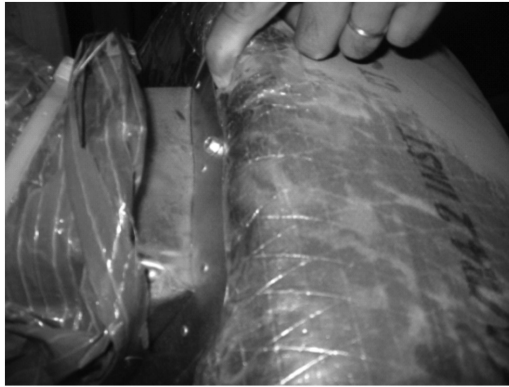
Heated or cold air blasting out of poorly installed ductwork.
